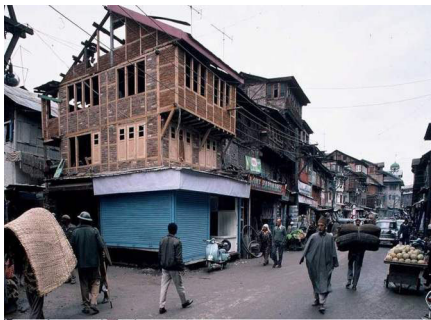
Dhajji-Dewari* construction used for a new house in Srinagar, Kashmir in 1989.
